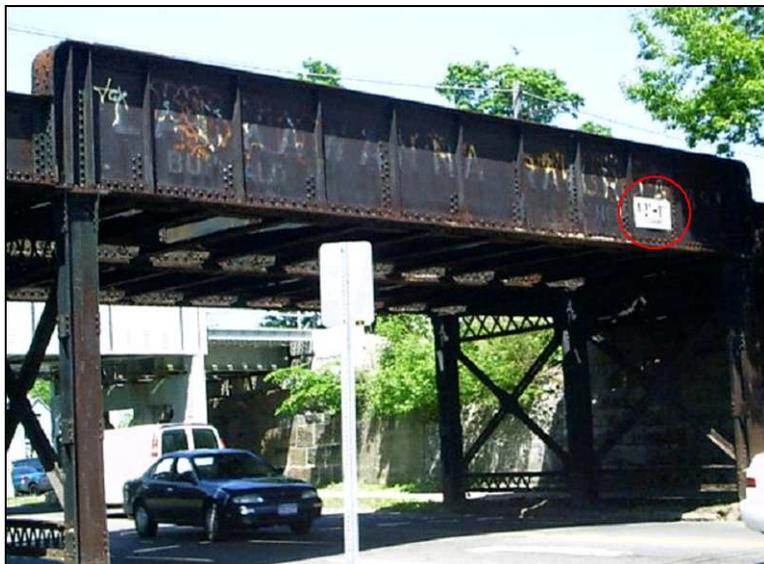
Warning Sign near Railroad Bridges over Front Street
